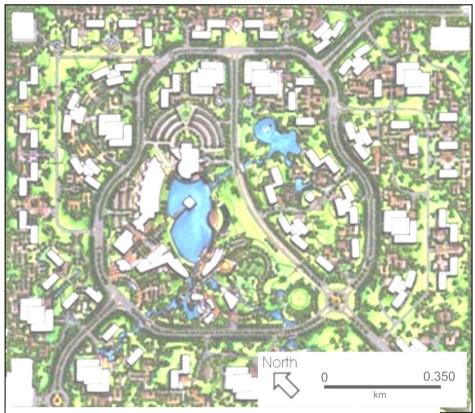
"Smart Village" site plan in Cairo, Egypt.
